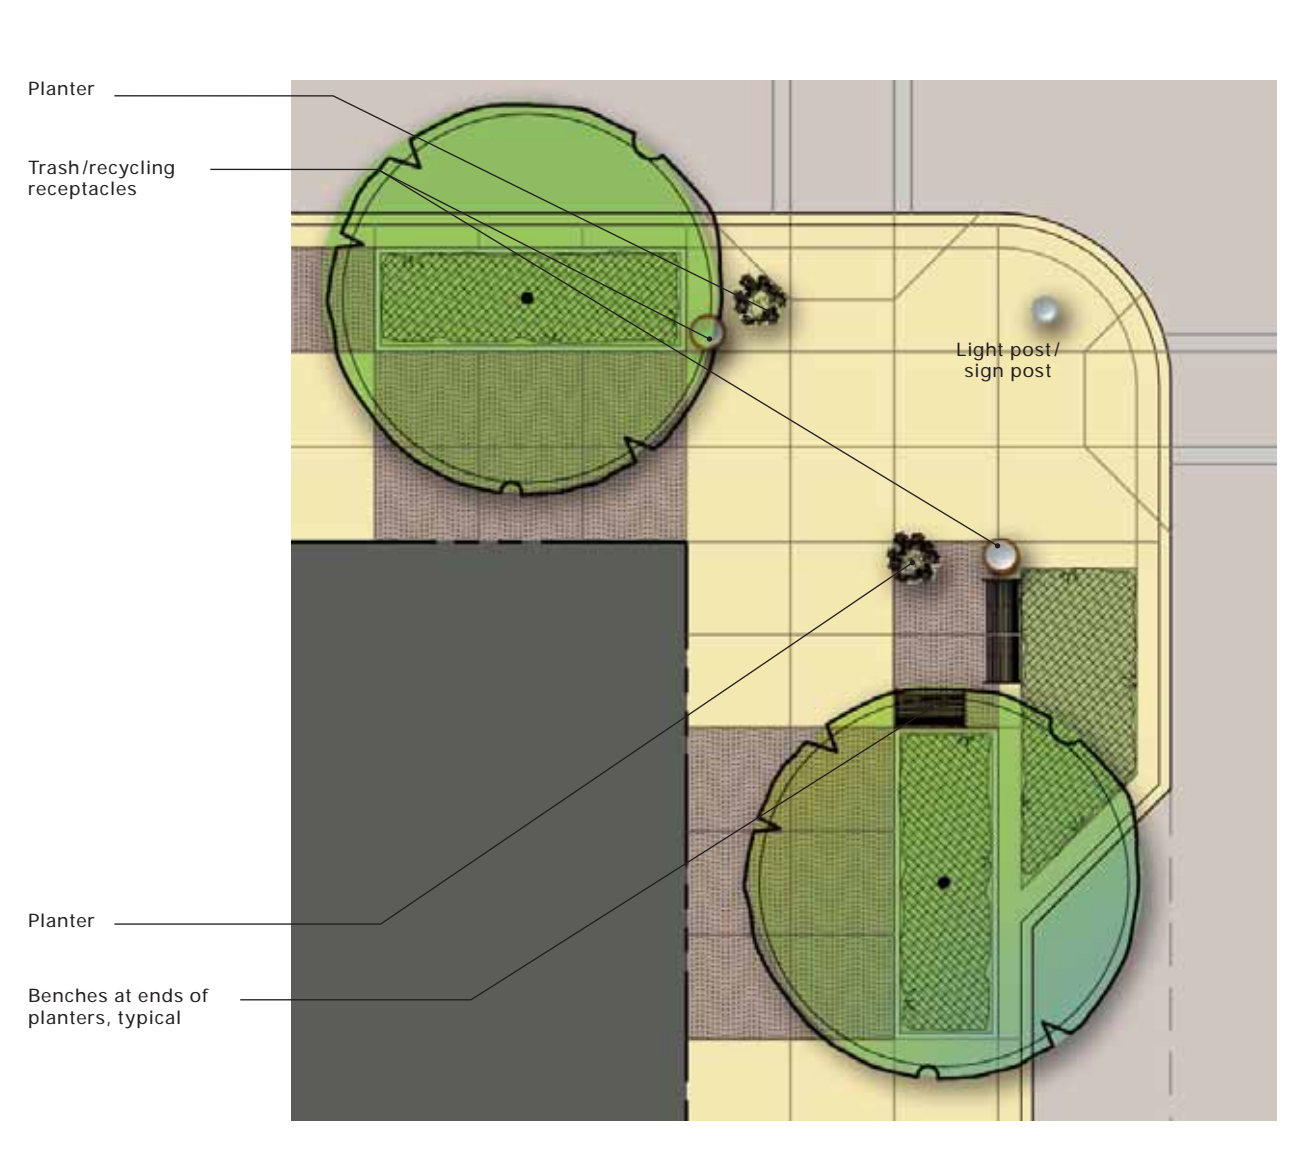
Example of street furniture configuration at an intersection showing benches and planters creating a small "garden room" and planters and trash/recycling containers along pedestrian paths. Additional plant material is incorporated in the curb bump-outs.
